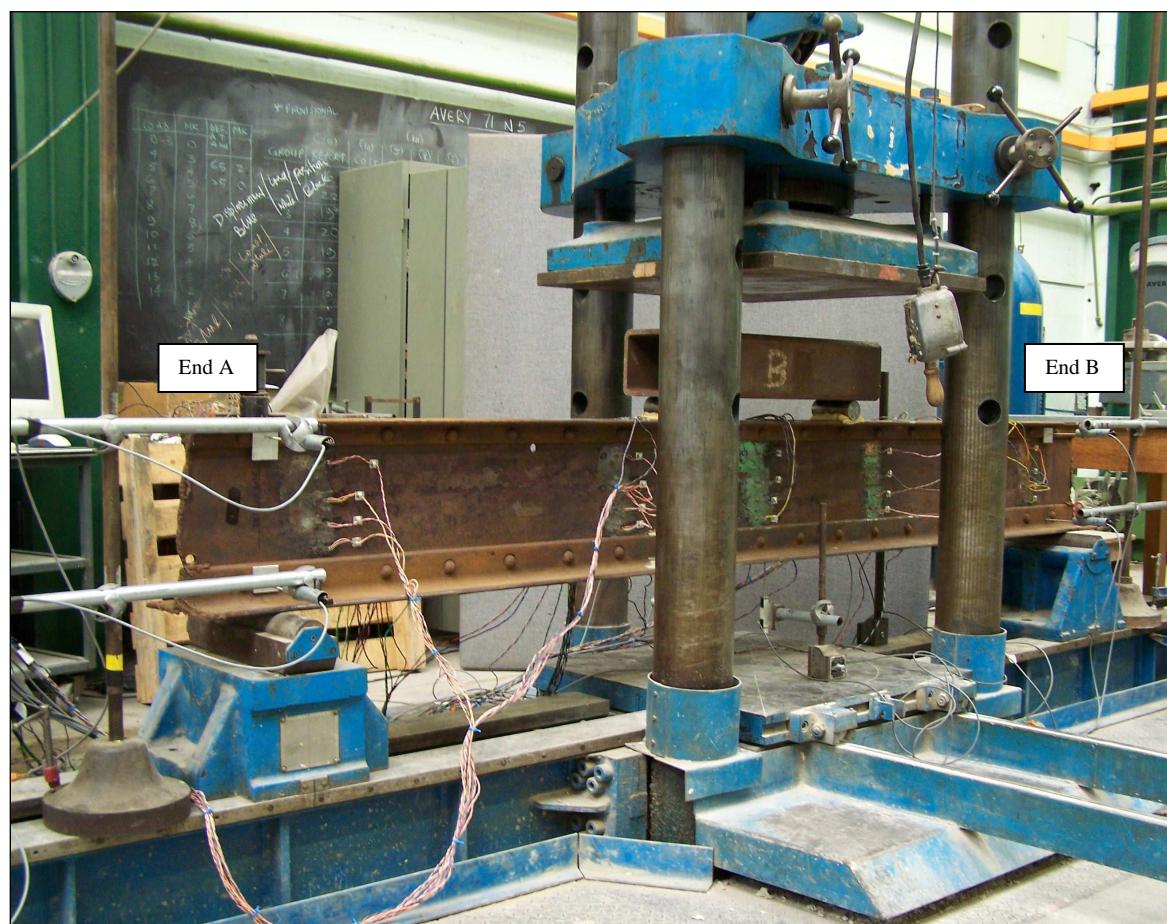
Testing arrangement for Edinburgh GPO beam. The front face of the beam shown here will also be referred to as the right-hand side of the beam. (Photo by M.O'Sullivan 2008)
